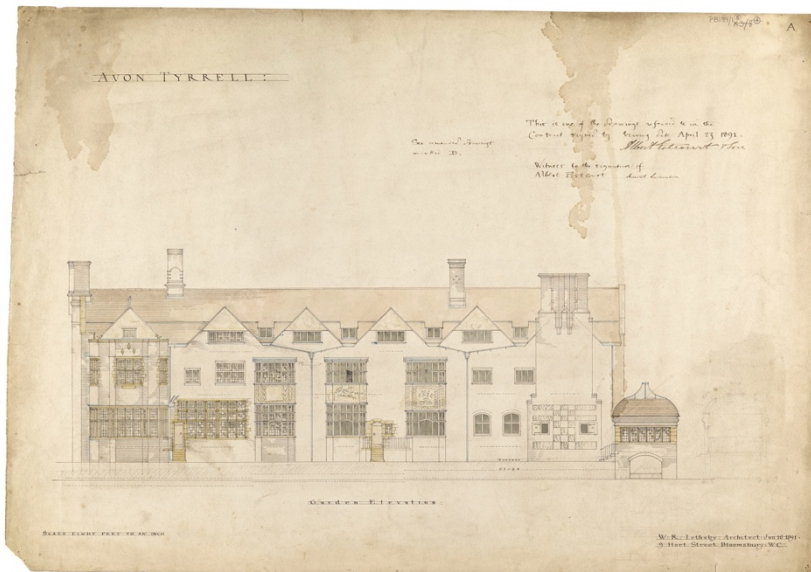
Avon Tyrell, Hampshire, W.R.Lethaby's Garden elevation drawing, Contract drawings, RIBA Drawings Collection, Victoria and Albert Museum
